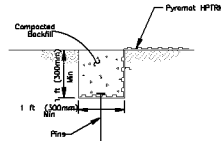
LONGITUDINAL EDGE TRENCH DETAIL
